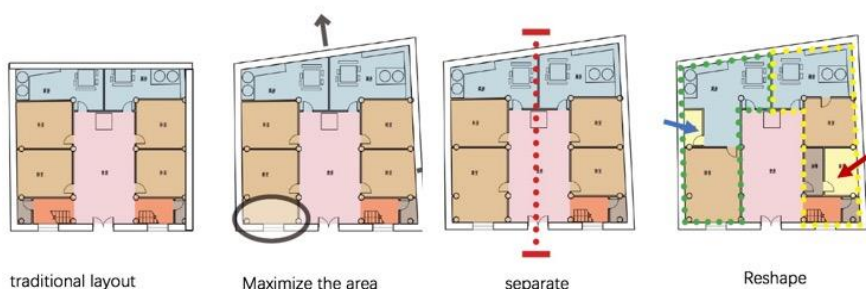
The process of Plan changing of No. 16, Qingwei Road house
